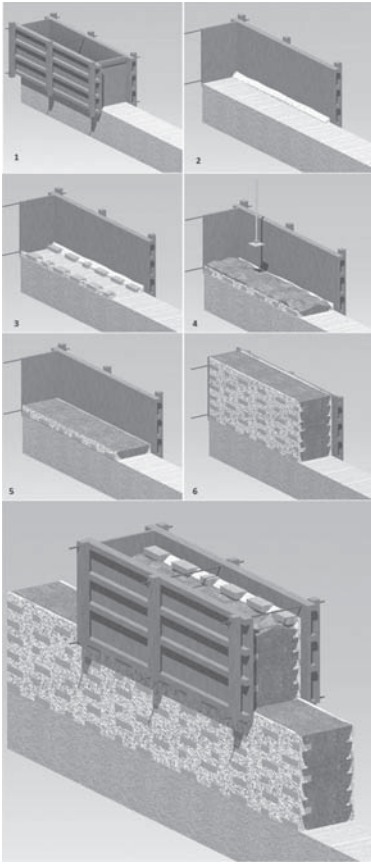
Construction stages of rammed earth wall lift with the face of alternating bricks and lime mortar. (Alliche, S., 2011).
